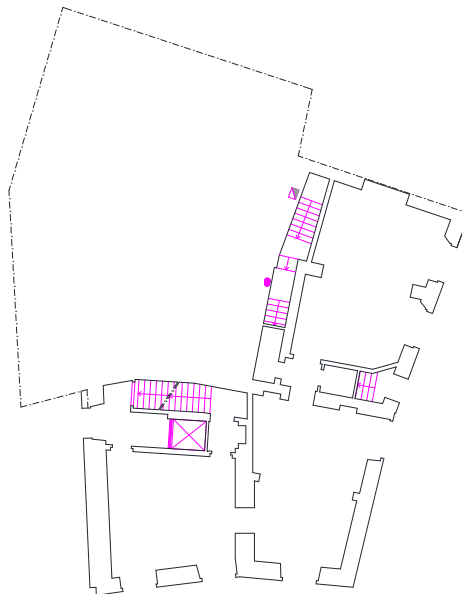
Plan view of the building aggregate at the ground level considered in the present study.
